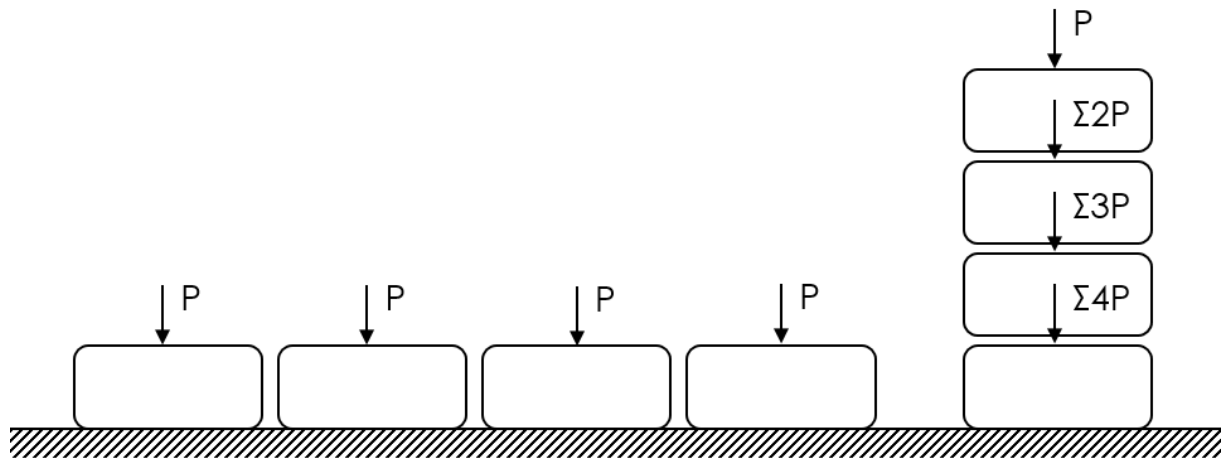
The difference in loads between a 1-story and 4-story building with the same total floor area.
